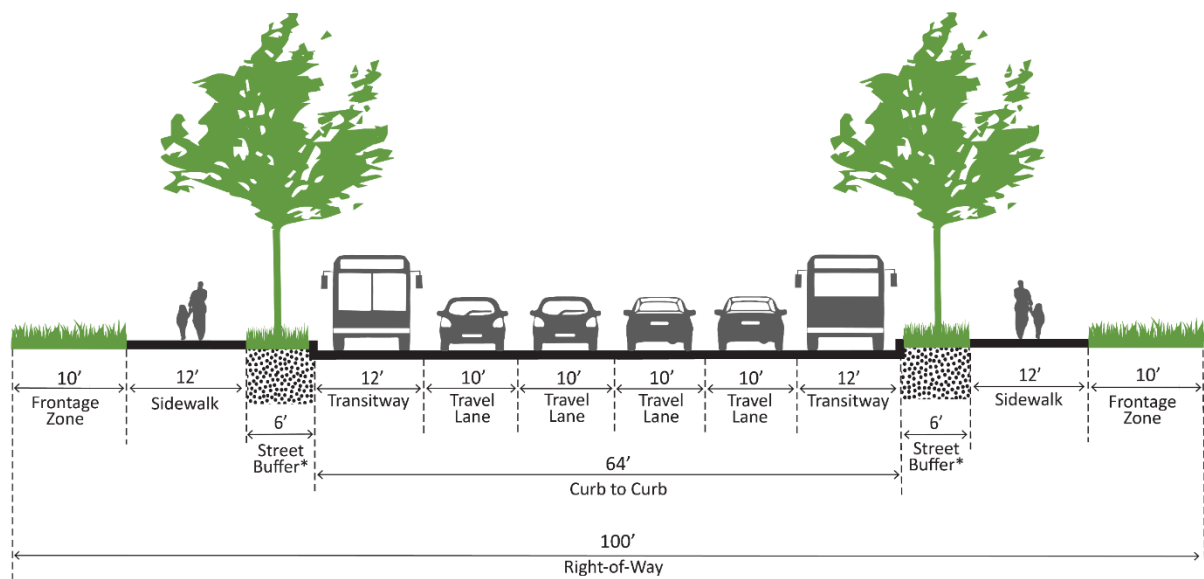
Colesville Road (M-10): Between Georgia Avenue and the Sarbanes Transit Center, Looking North
